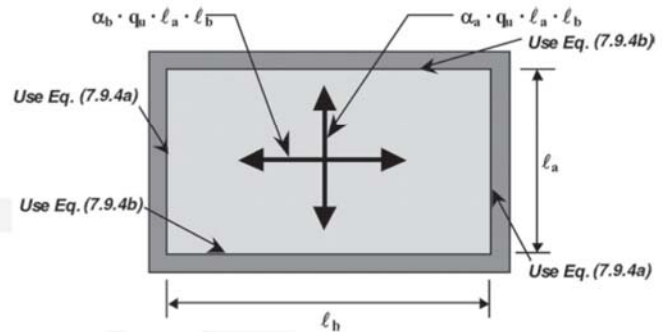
Fraction of the total load in the panel acting in each direction in two-way slabs supported on girders, beams, or reinforced concrete walls.
